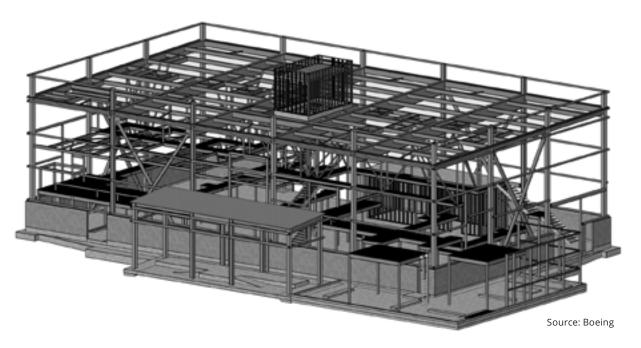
3D model of building looking southwest. This model shows several stairways leading to different catwalk levels.
